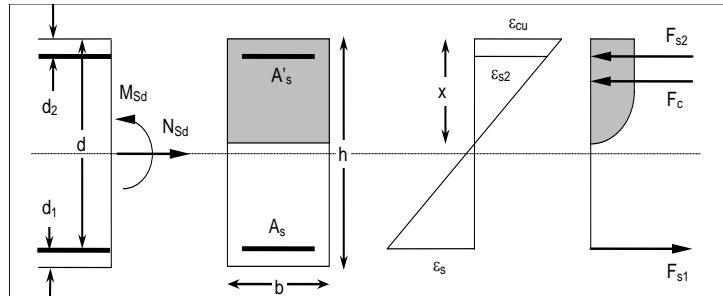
Structural design, primary lining, egress tunnel, SC G, normal load case
